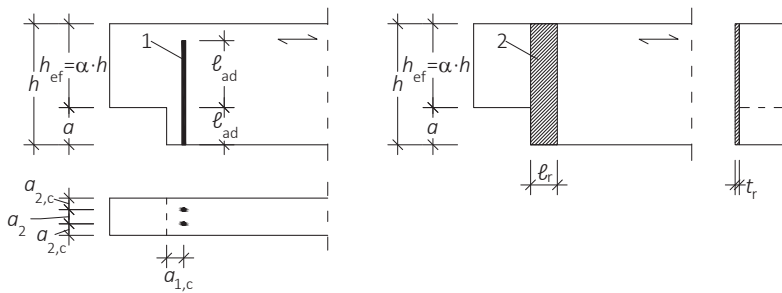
Reinforcement of notched beams with geometric details, 1: Reinforcement with fully threaded screw / glued-in rod, 2: Reinforcement with glued-on plates.
